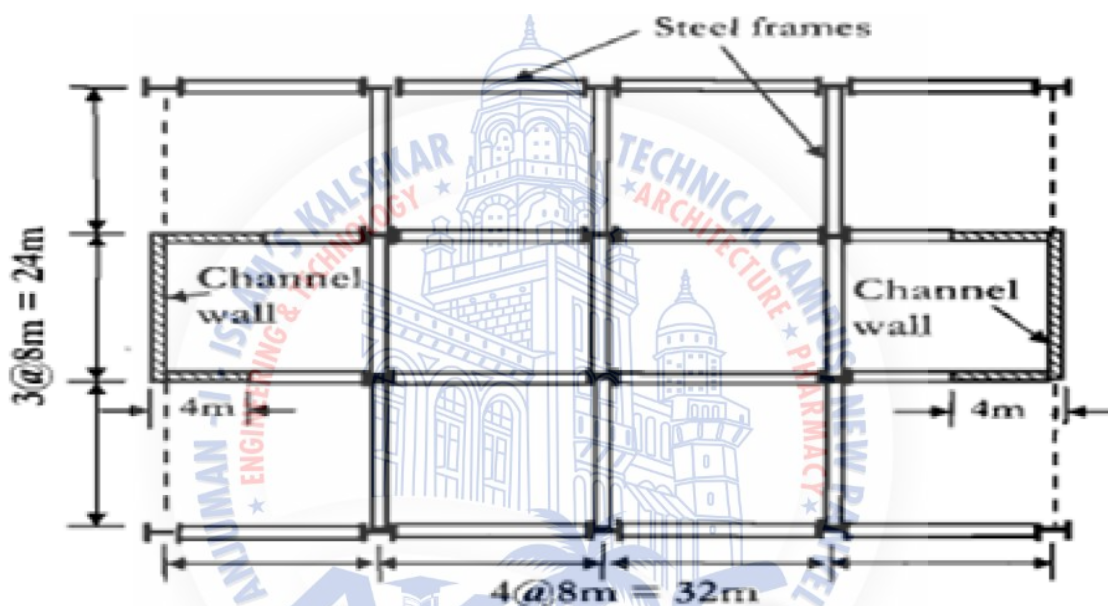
Plan View for the Studied Dual Frame-Wall Buildings. [16]
